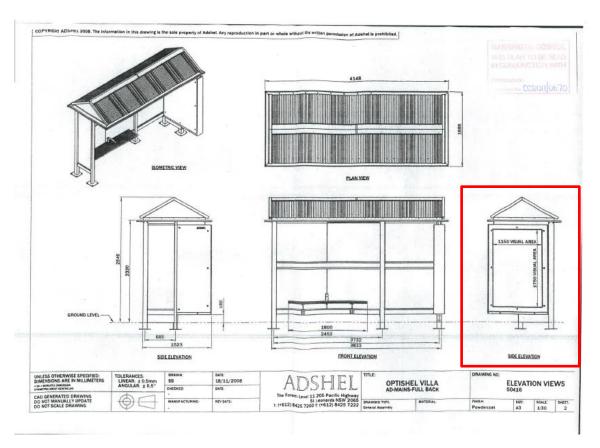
Shelter G2 CC2011/0670 Stamped Elevations indicating advertising panel (outlined red)
